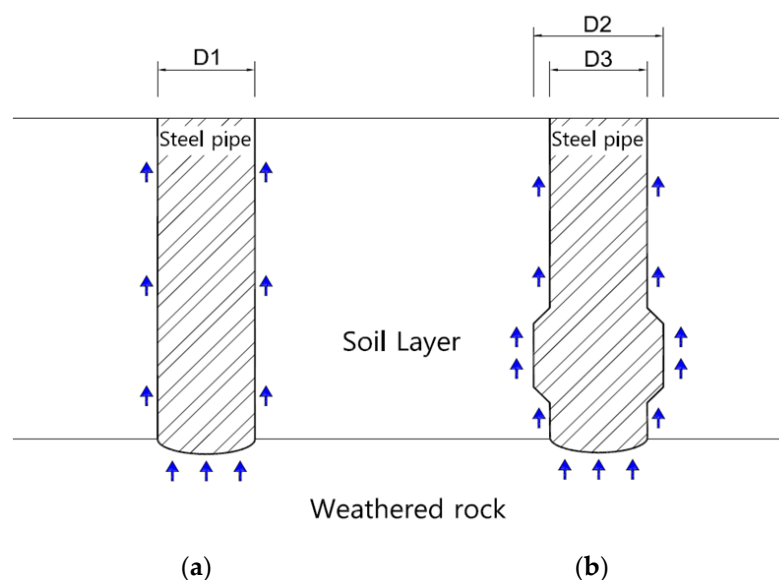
Configuration and bearing capacity characteristics of conventional steel pipe pile and expanded steel pipe pile: (a) Conventional steel pipe pile; (b) Expanded steel pipe pile.
